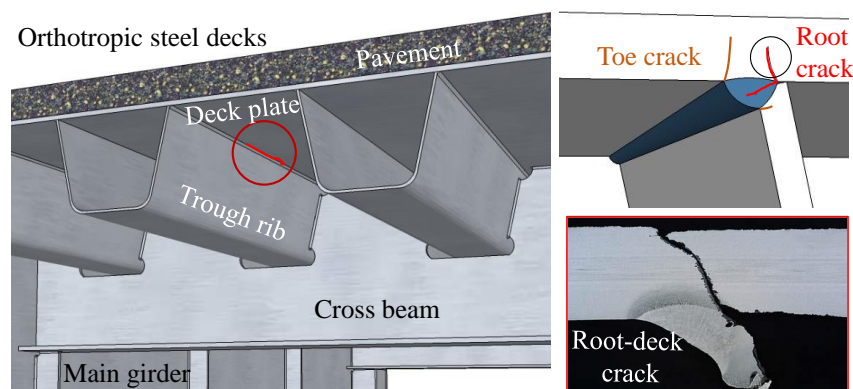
Root-deck cracks at rib-to-deck welded joints
